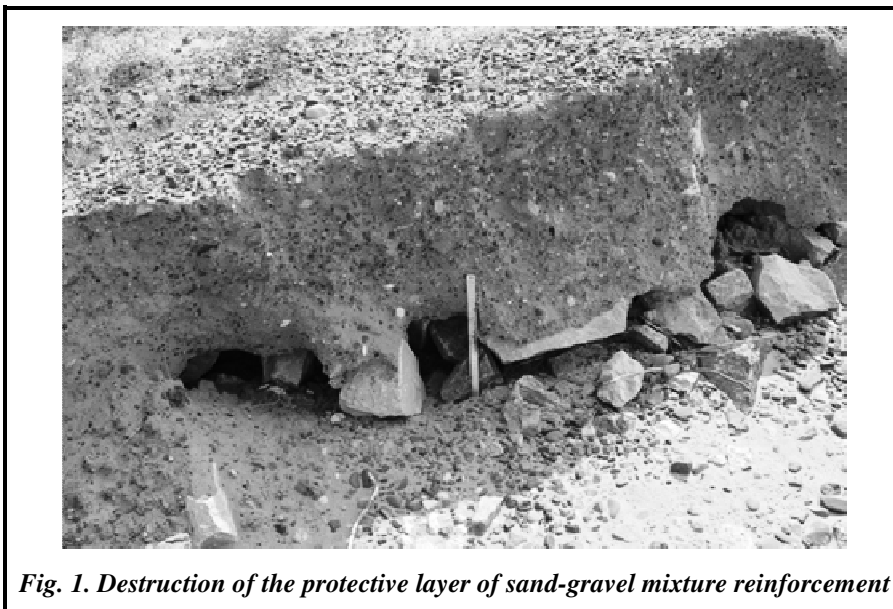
Destruction of the protective layer of sand-gravel mixture reinforcement
